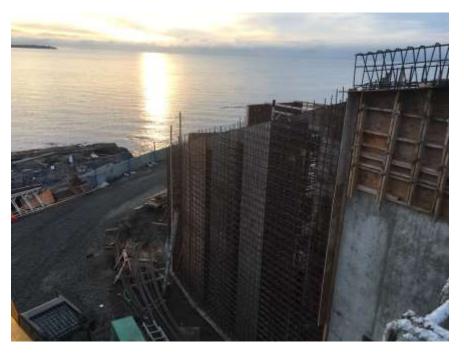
Clover Point Pump Station- Formwork and rebar for curved retaining wall.
